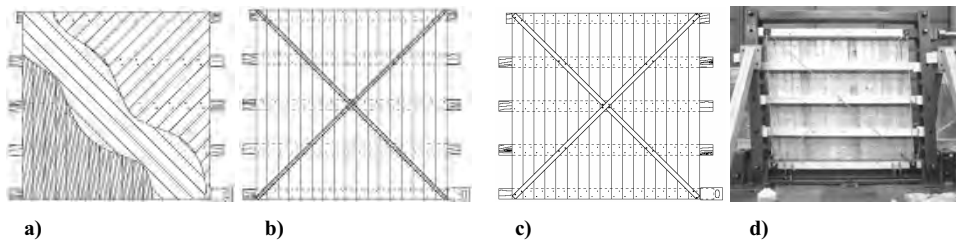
Different strengthening interventions using: (a) rotated double planking; (b) orthogonal double planking with wooden diagonal; (c) orthogonal double planking with steel diagonal. (d) Steel frame used for laboratory tests (Valluzzi et al., 2008).
